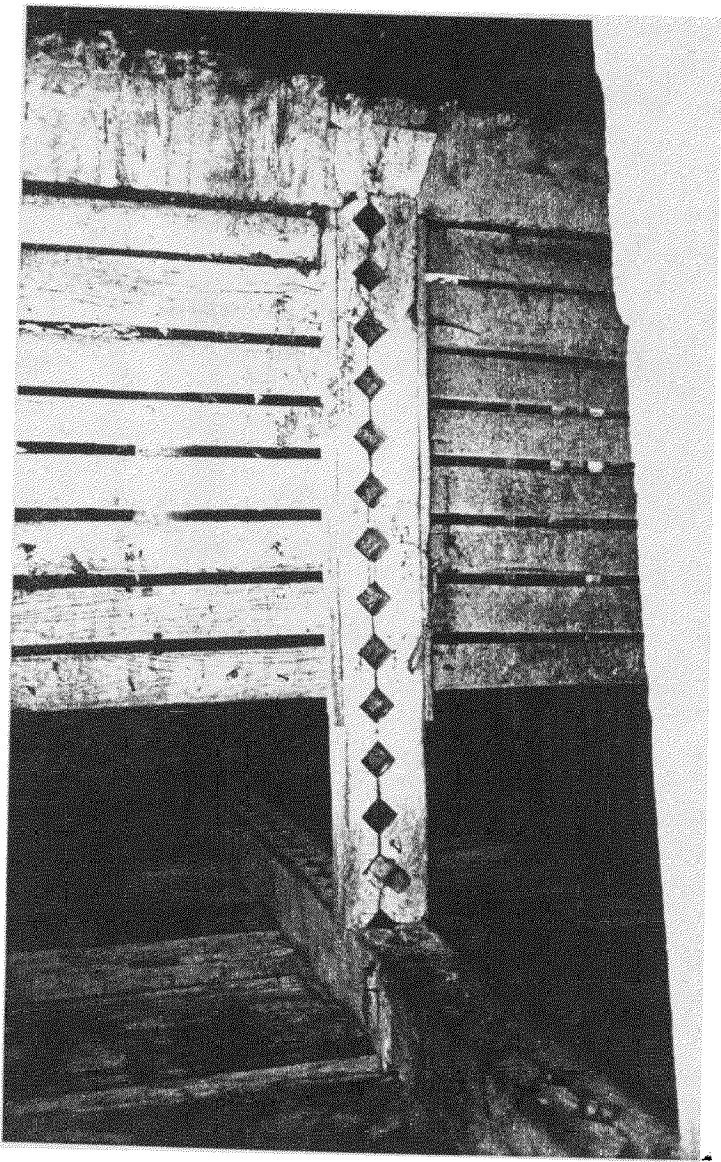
Same as above, from East towards west side. wall to left is to be removed & opened up
